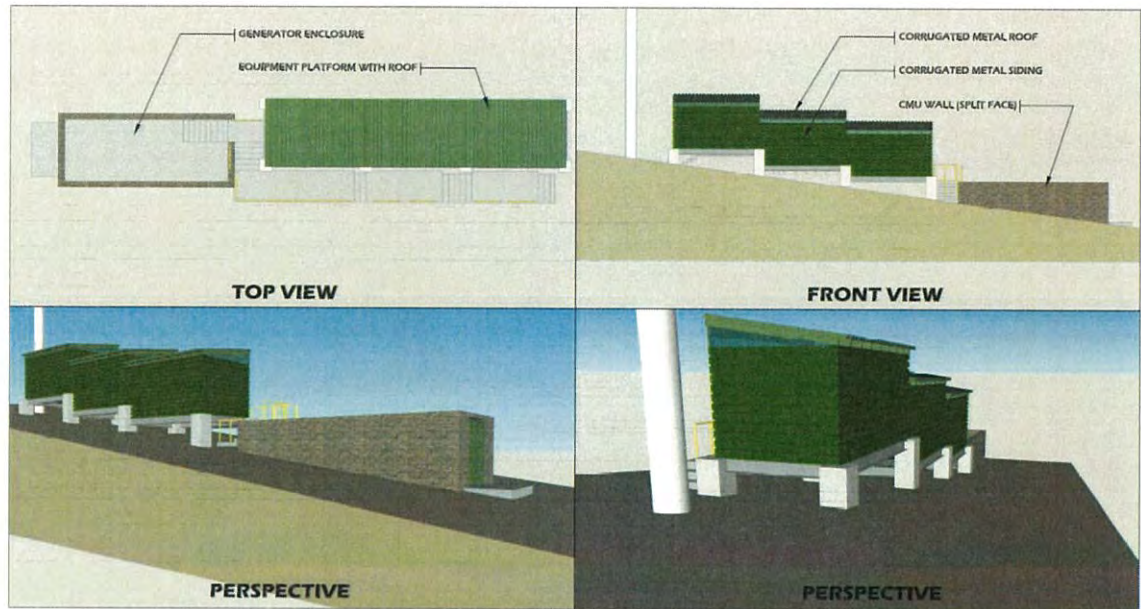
Proposed 10-foot tall corrugated metal equipment enclosure and 10-foot tall CMU block wall enclosure.
